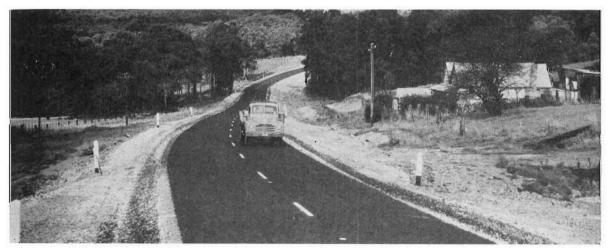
Midland Highway, Section 2. Reconstructed section north of Daylesford. Glenlyon Shire.
